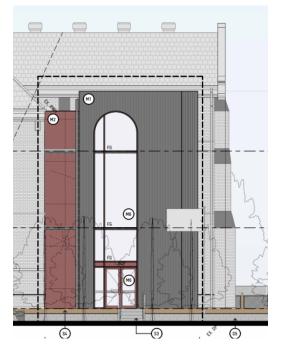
Extract of TP21 P2 2, showing the north façade of the South Wing addition. Source: Y2 Architecture, 2023.
